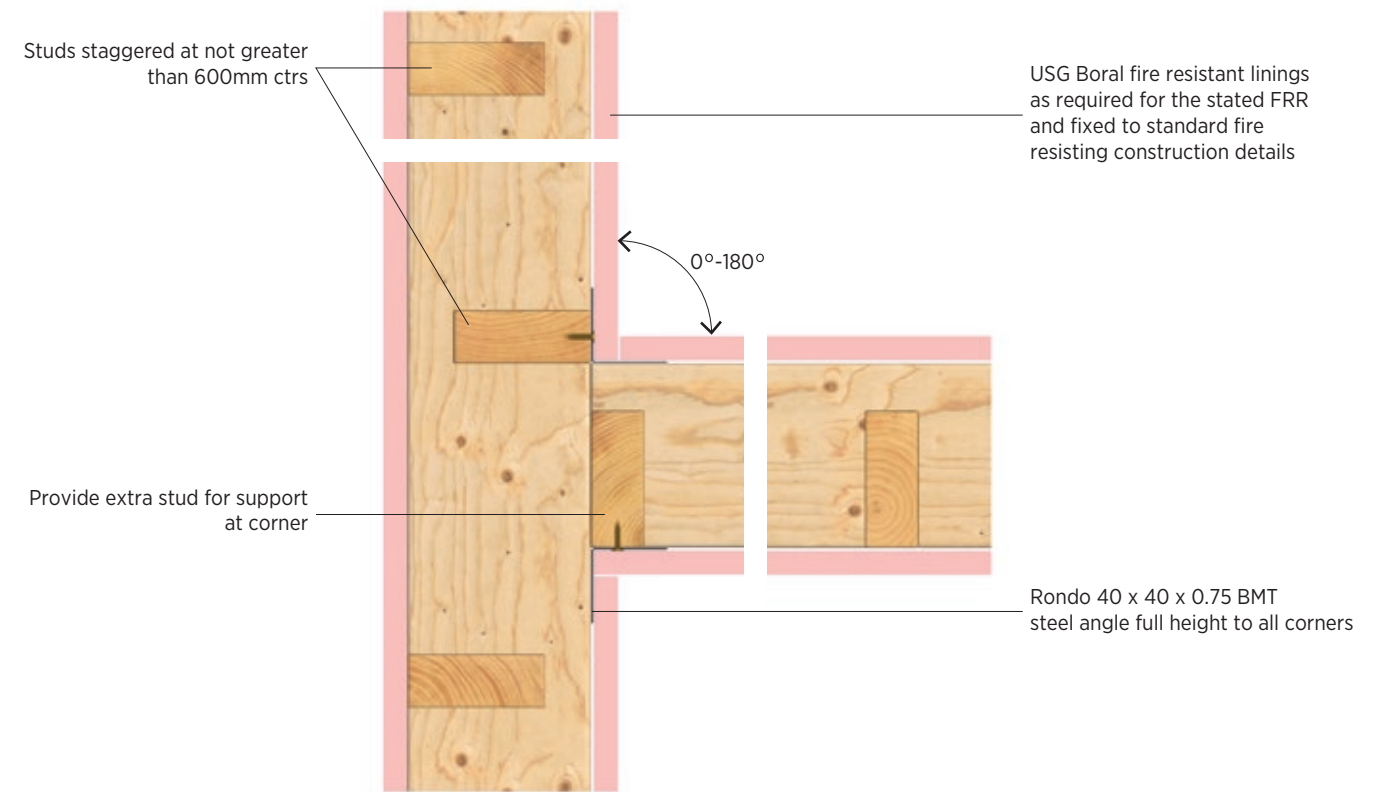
Staggered Timber Stud Wall – T Junction Detail
